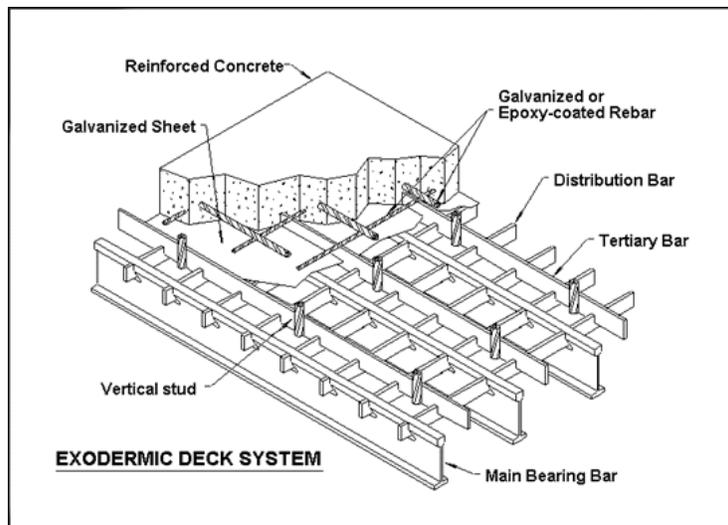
Original *Exodermic*[™] bridge deck system (6).
